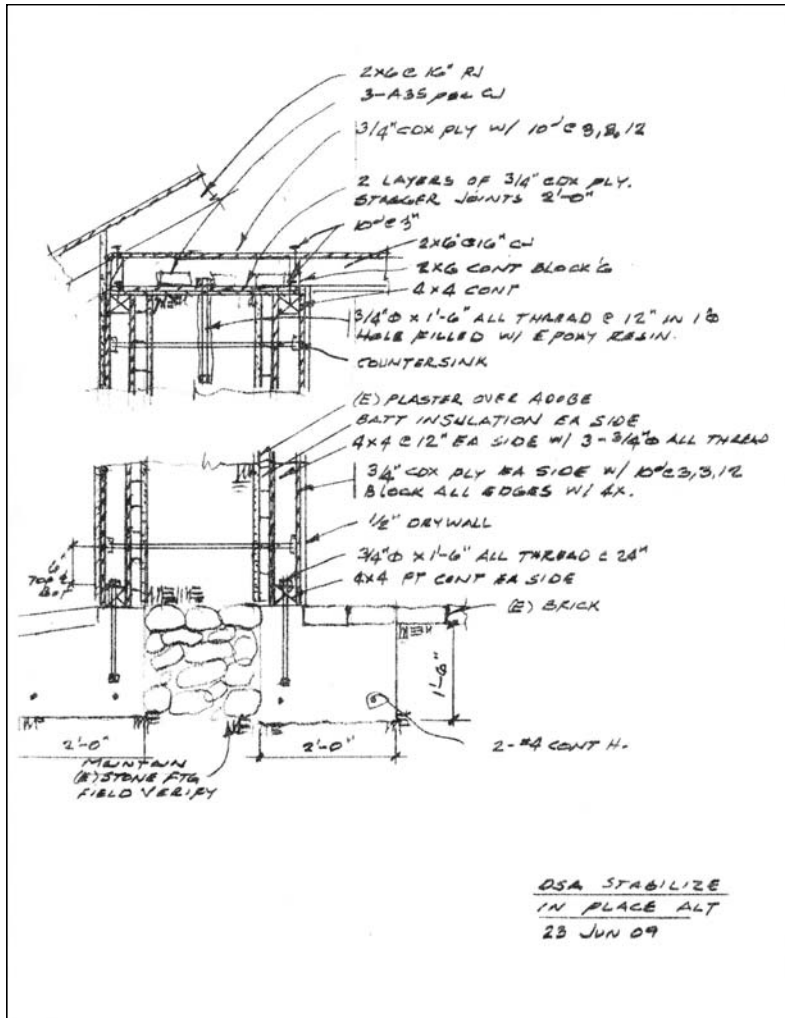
Sketch detailing DSA stabilization option, June 23, 2009. (Drawing prepared by Michael Krakower)
